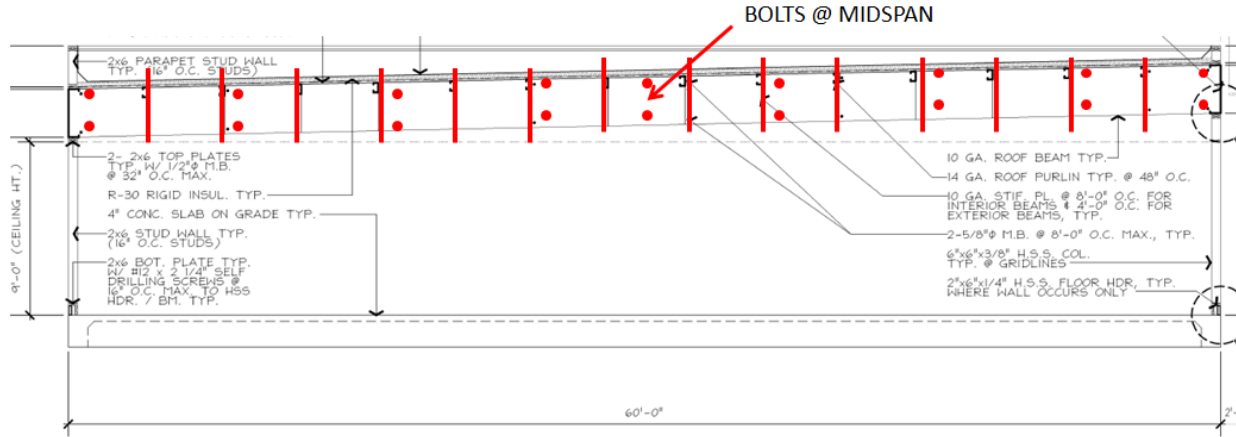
Bolt and Stiffener Plate Locations for 60' Beam Spans
